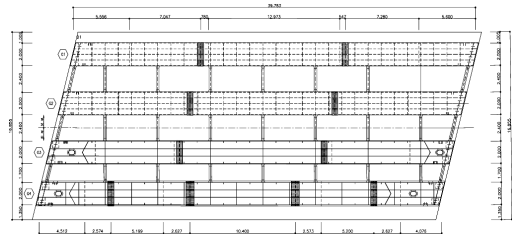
Plan view of the steel box girder bridge (unit: mm)
